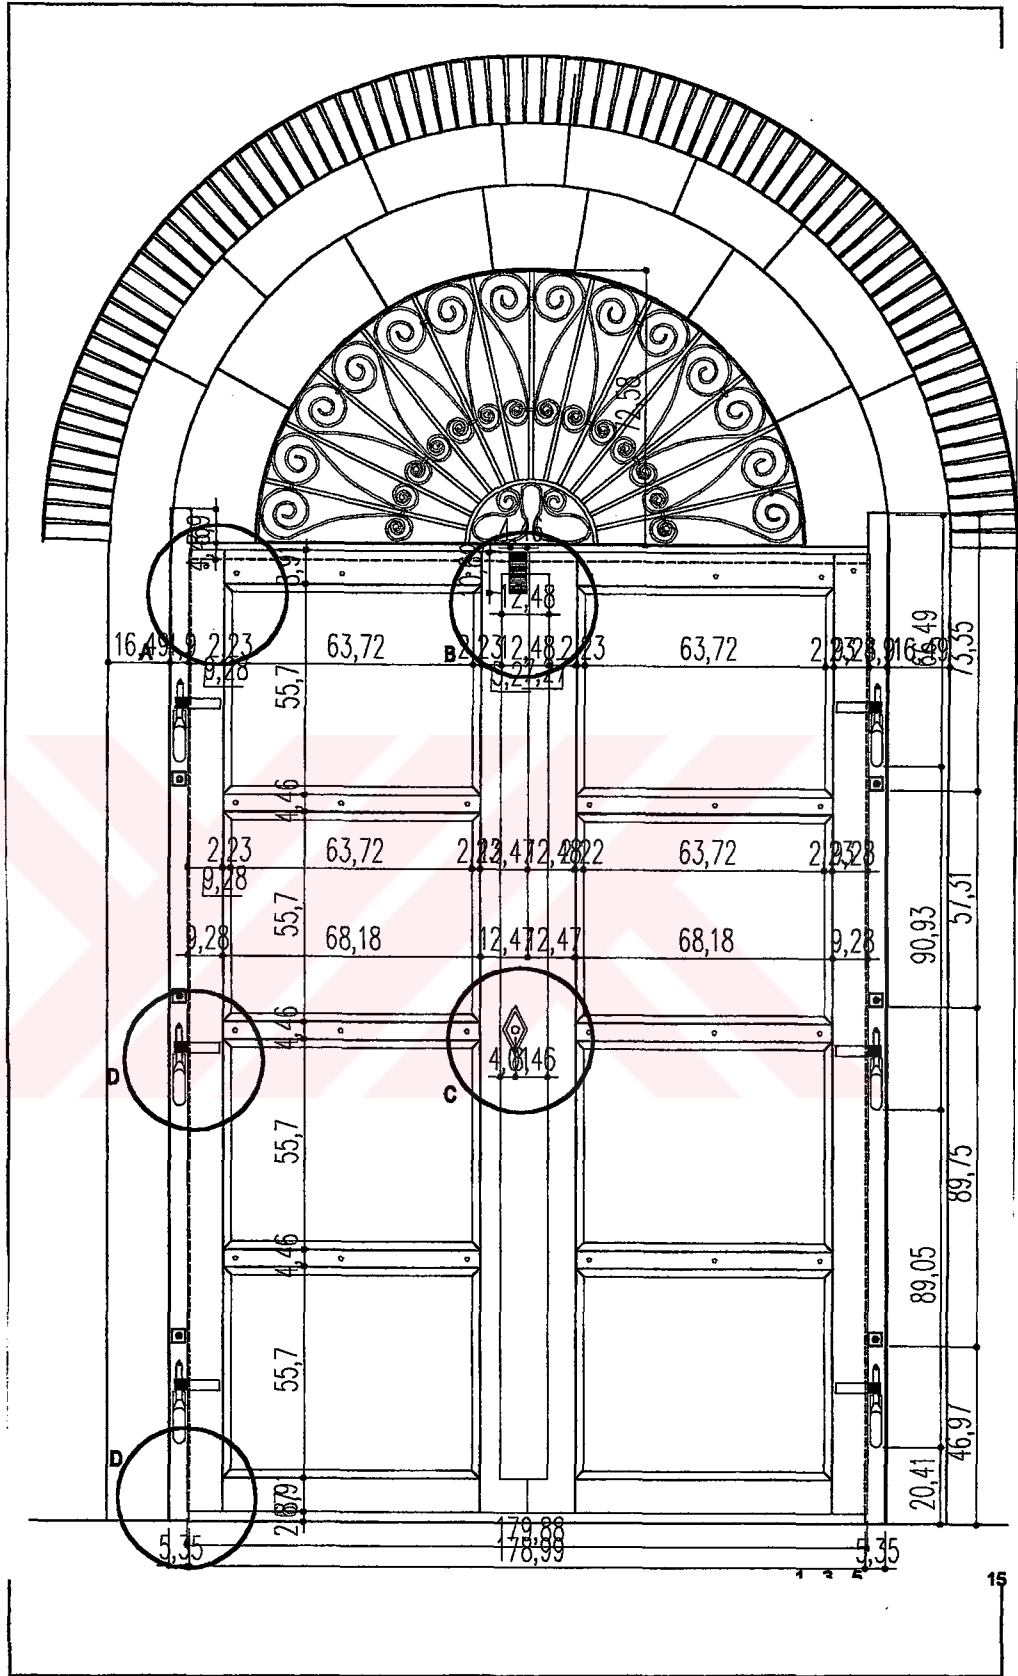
DM02 İzmir Caddesi No:1 – Elevation and Plan
